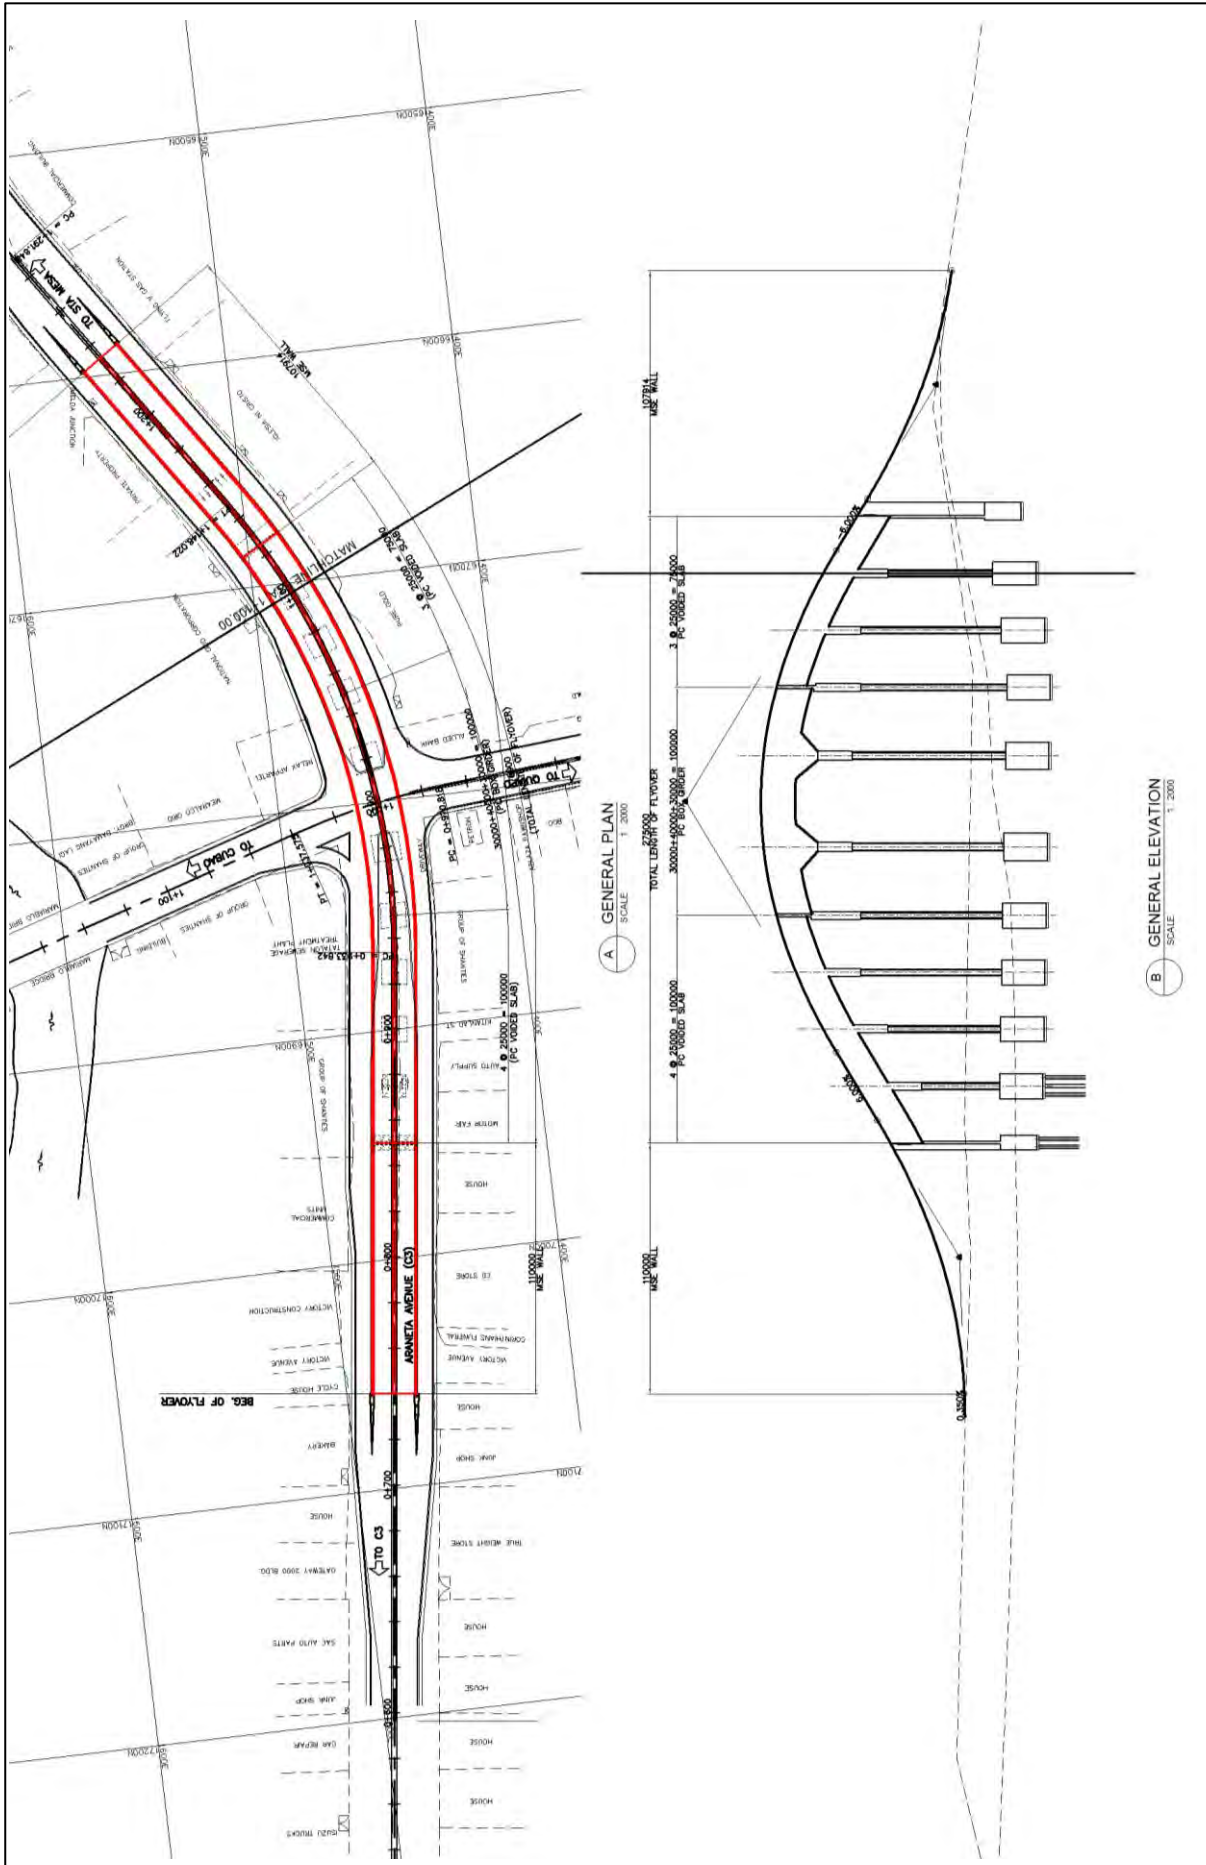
Plan and Profile of Scheme-1 C-3/E. Rodriguez Interchange (1/2)
